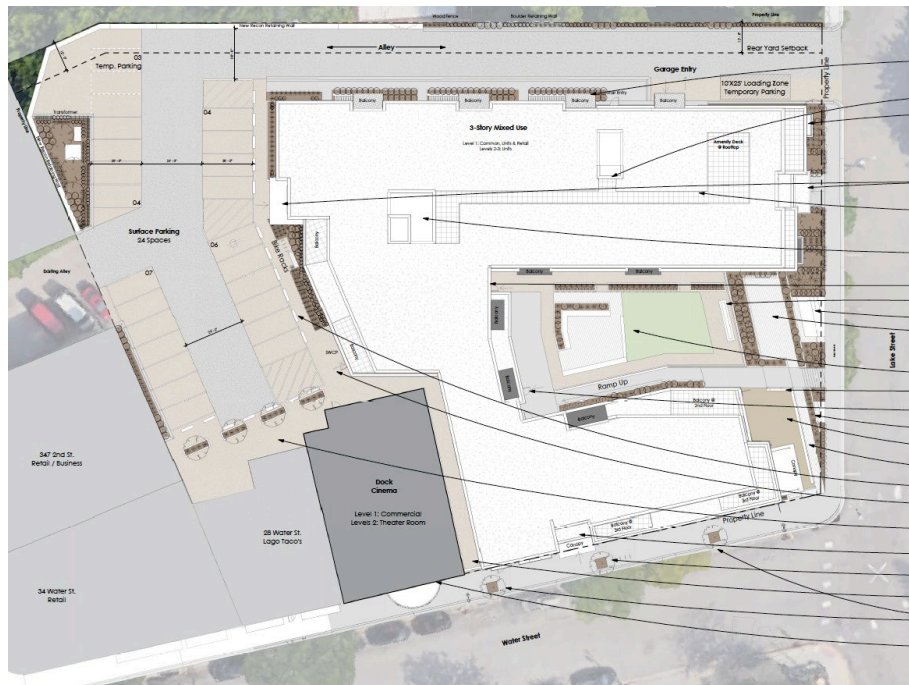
April 2025 site plan reviewed by HPC (plan does not match aerial photographs of site in Fig. 4)
